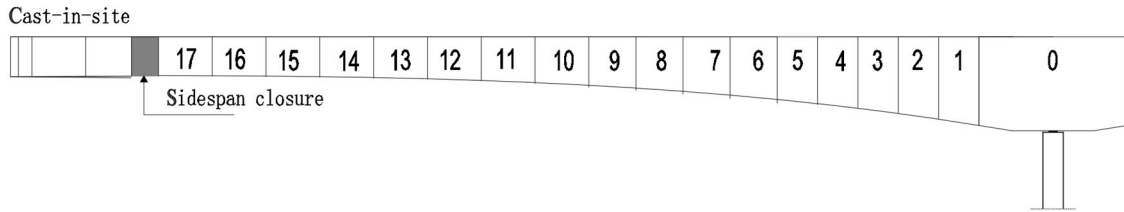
Cross section of 290m span prestressed concrete bridge (unit: cm)
